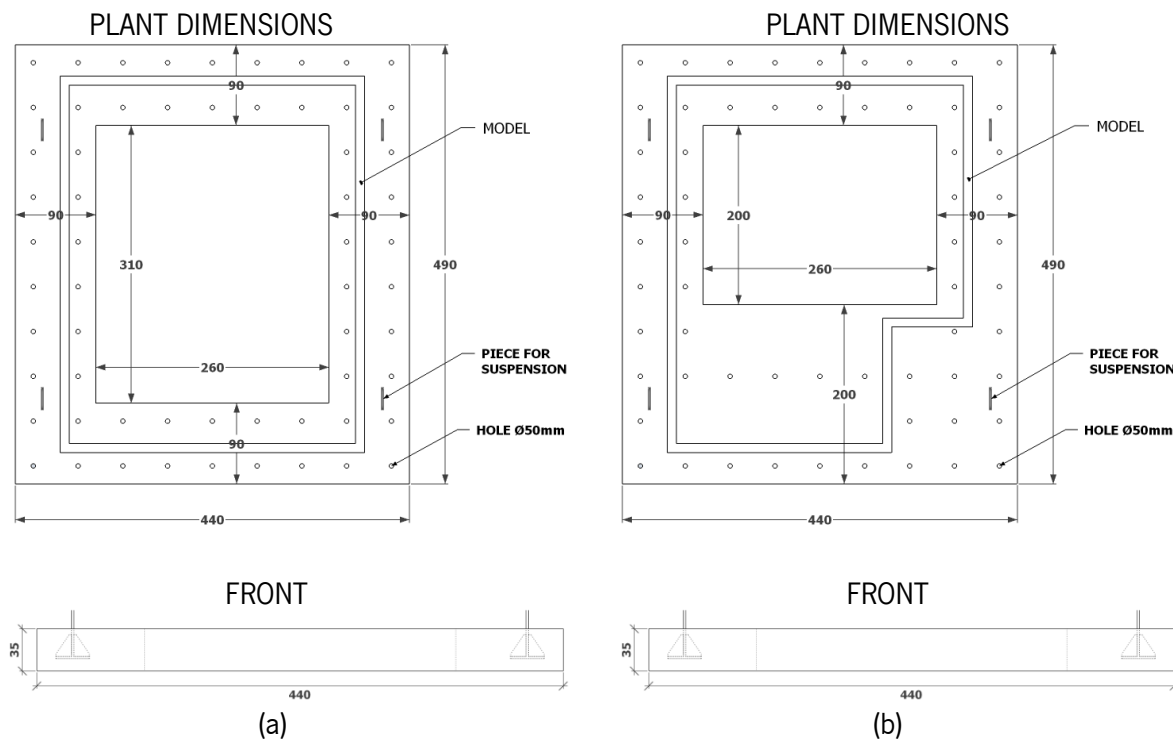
Geometrical dimension (in cm) for ring beam foundations: (a) symmetric buildings and (b) asymmetric buildings
